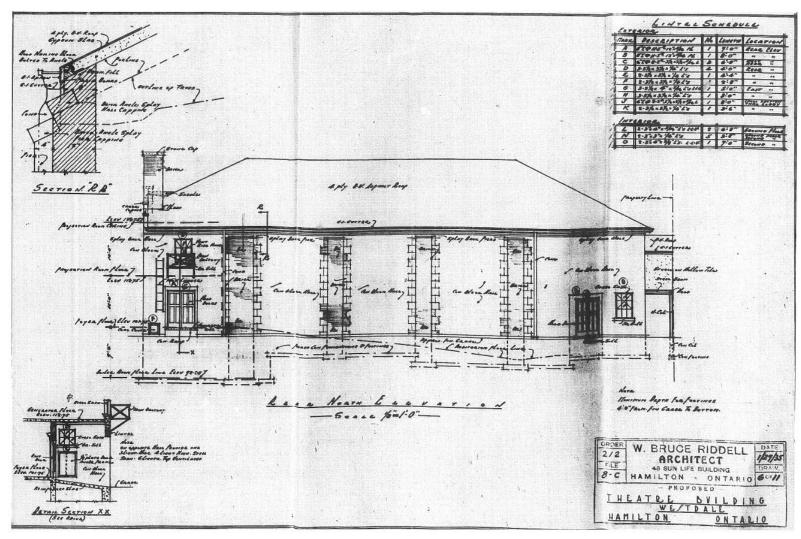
North Elevation Drawing showing Balcony, Fire Escape, Windows, Doors and Brick Piers (Riddell 1935d: Provided by City of Hamilton)
